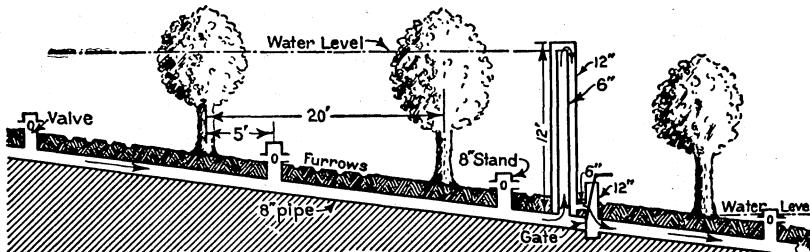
Use of underground pipe in furrow irrigation, showing riser and stand
